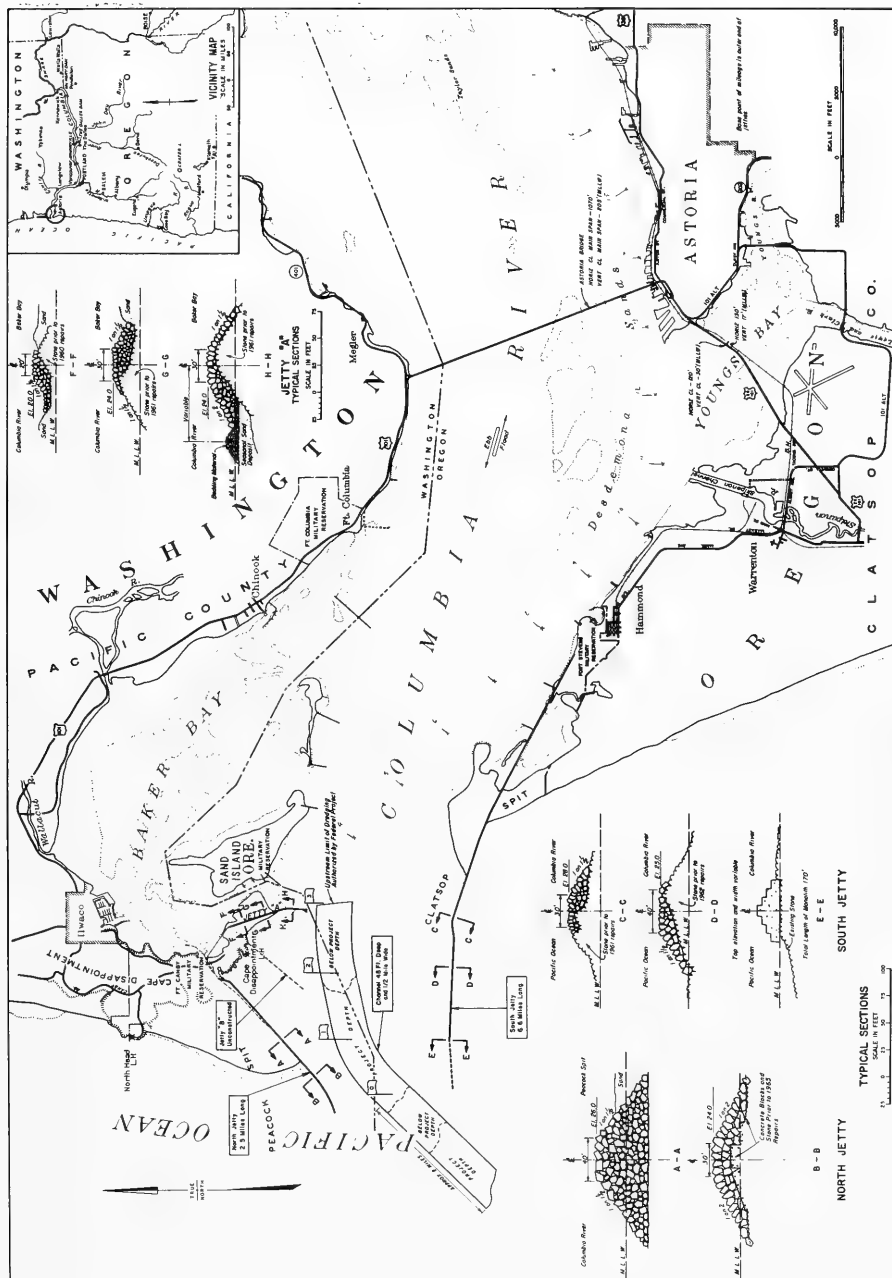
Site layout of Columbia River at Mouth, Oregon and Washington (revised 1979)
